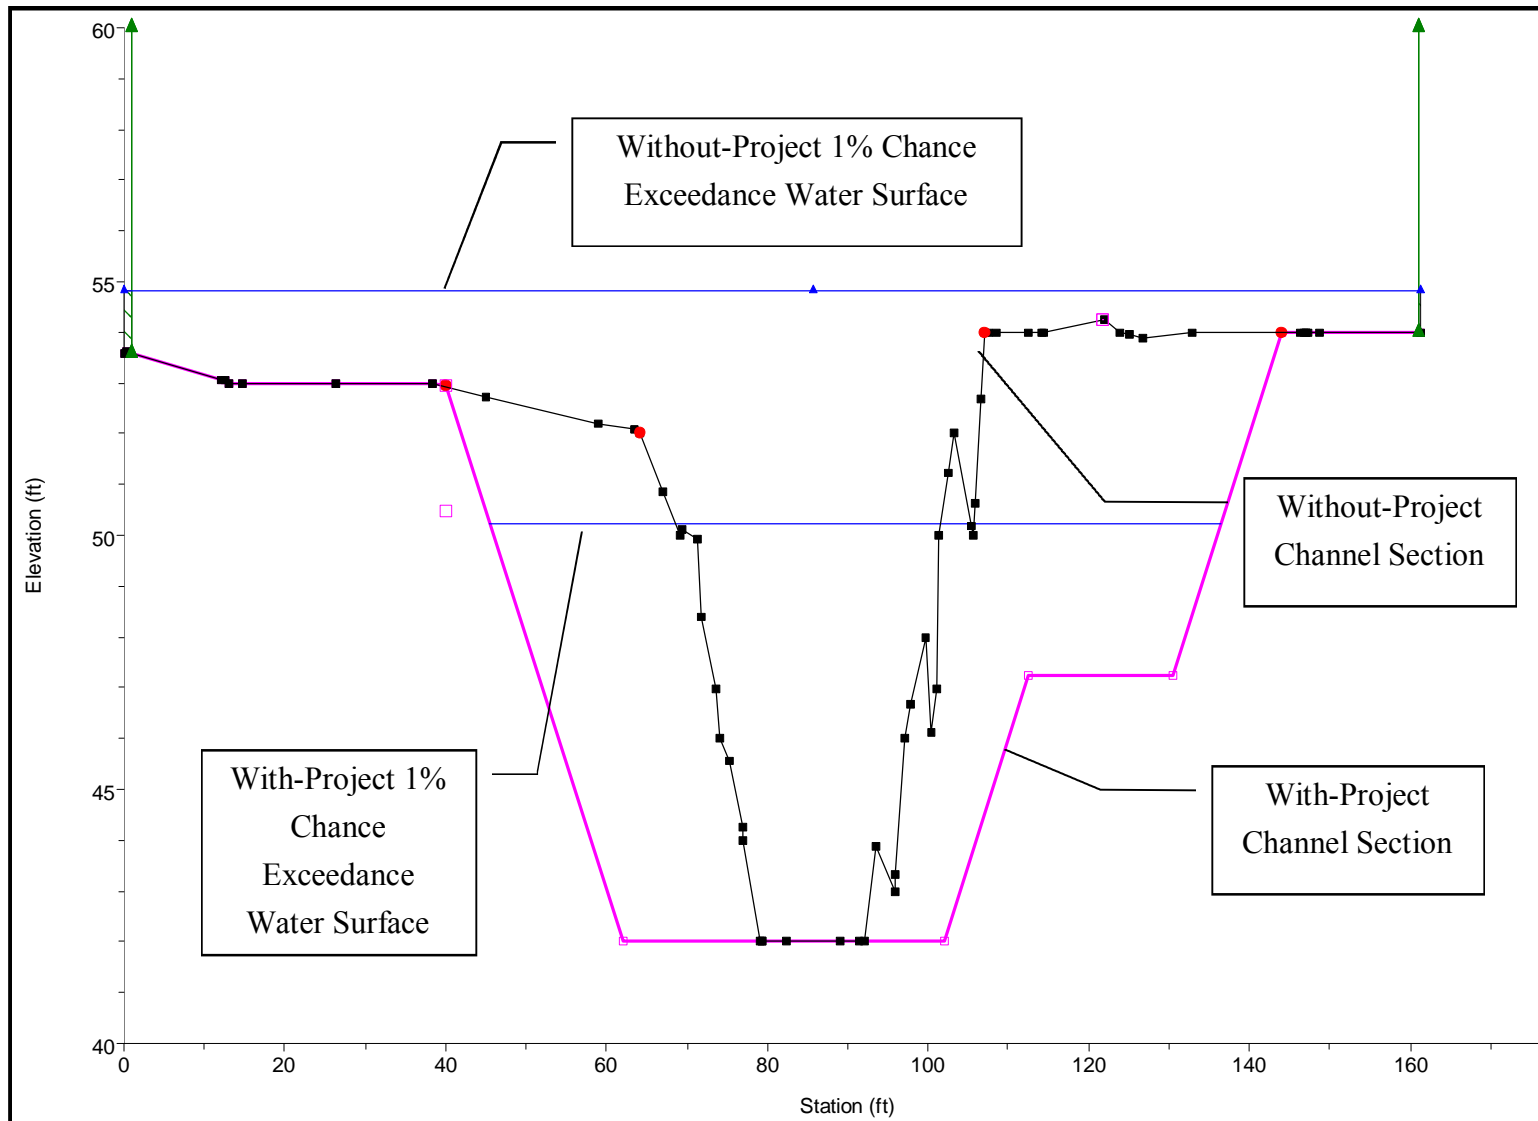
Typical D/S section, with- and without project geometry for Alt. 2B
